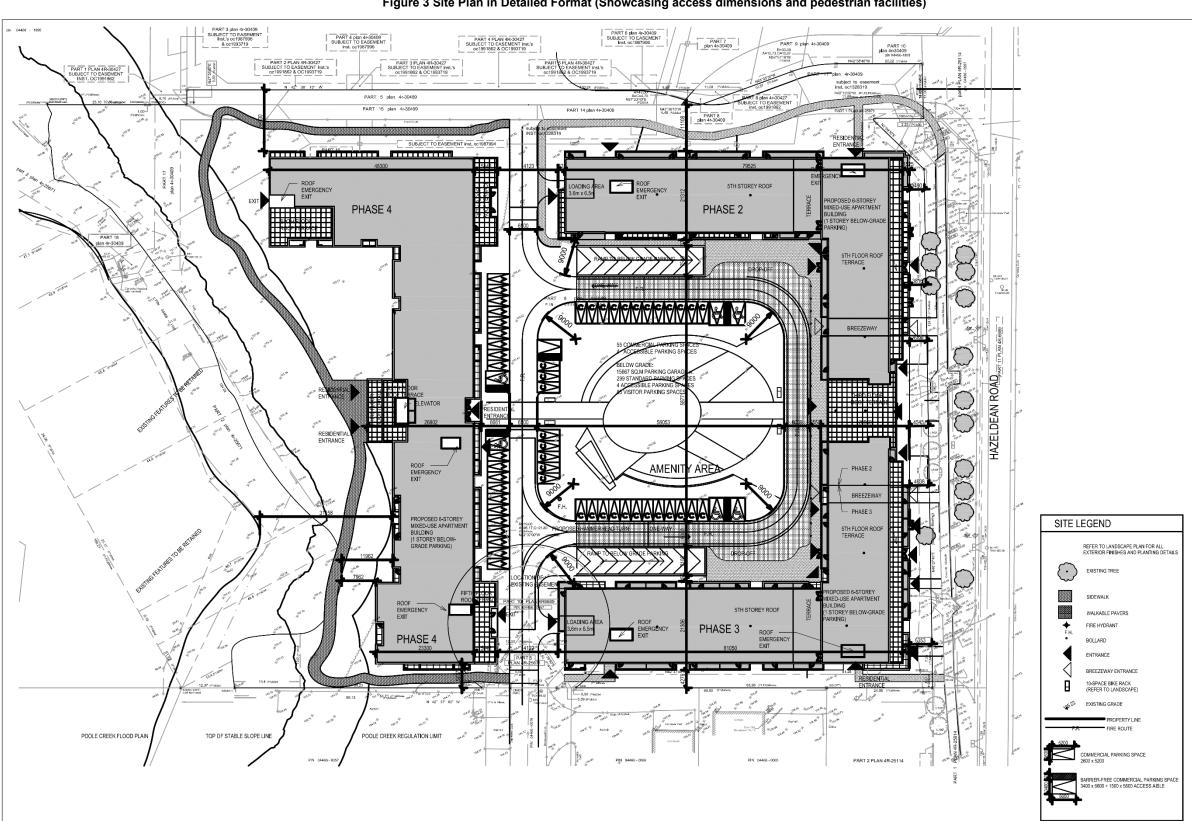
Site Plan in Detailed Format (Showcasing access dimensions and pedestrian facilities)
